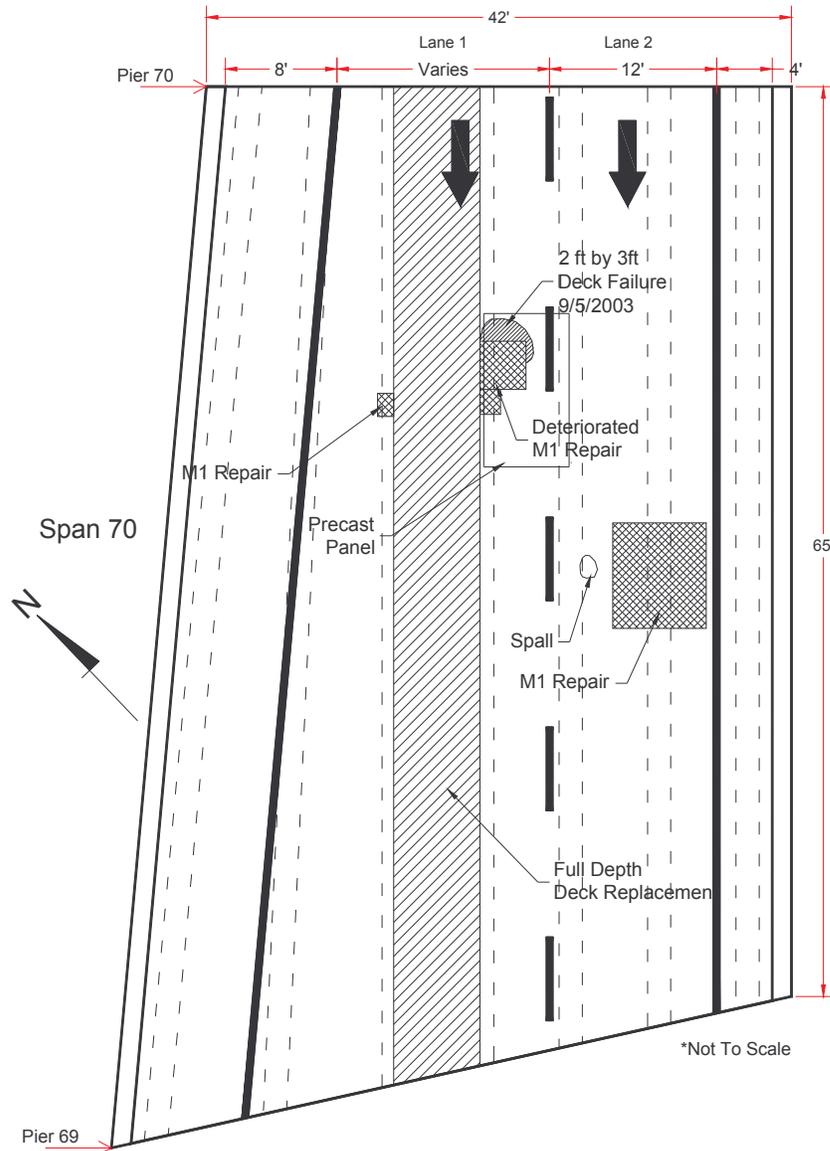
Location of Failed Panel, Bridge 100332 Span 70
